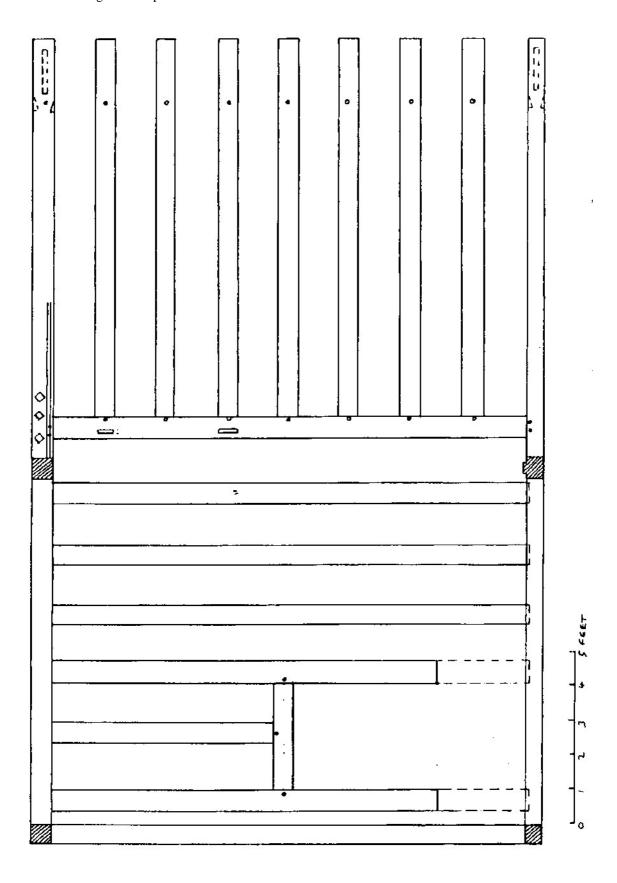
Mascotts, Copford: Joist Plan of view down Crosswing
